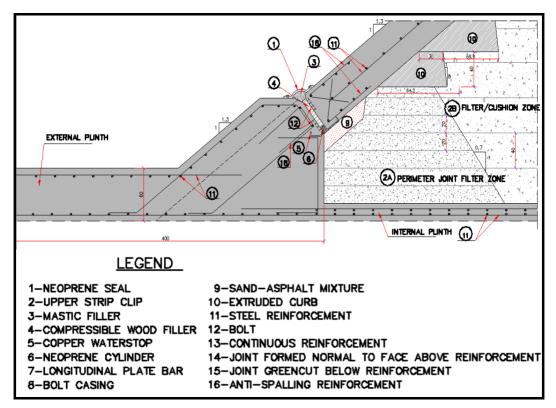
Horizontal plinth cross-section of Gökçeler Dam (Hidro Dizayn, 2007-c)
